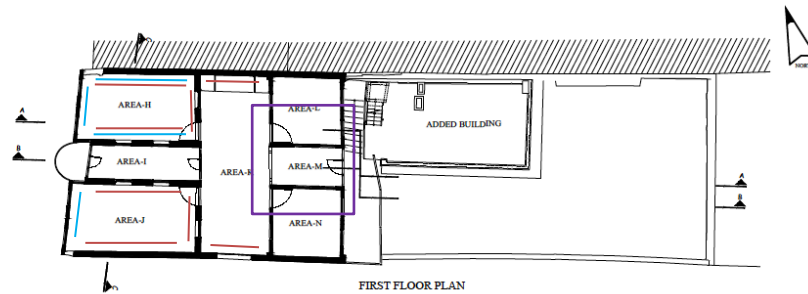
Adana-Tepebağ case study house first-floor plan [1].
